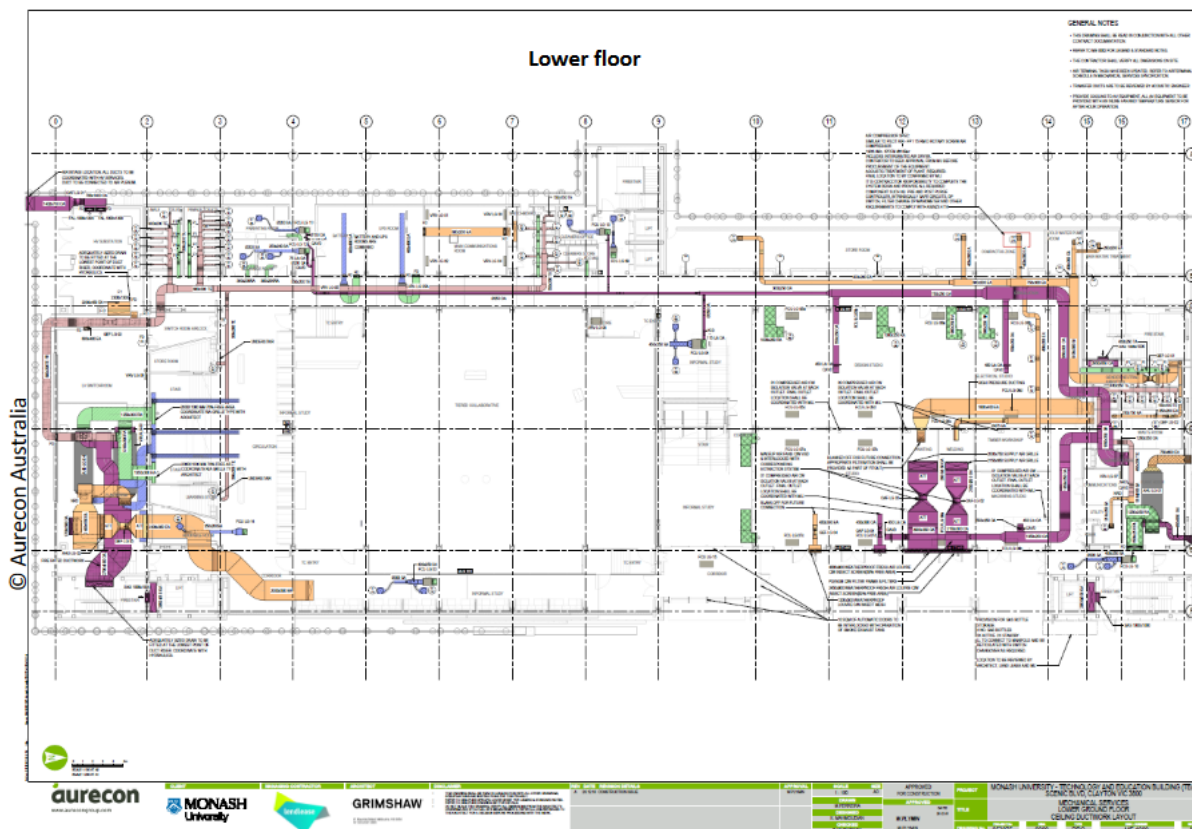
Plan view highlighting the complexity of the building's mechanical system
